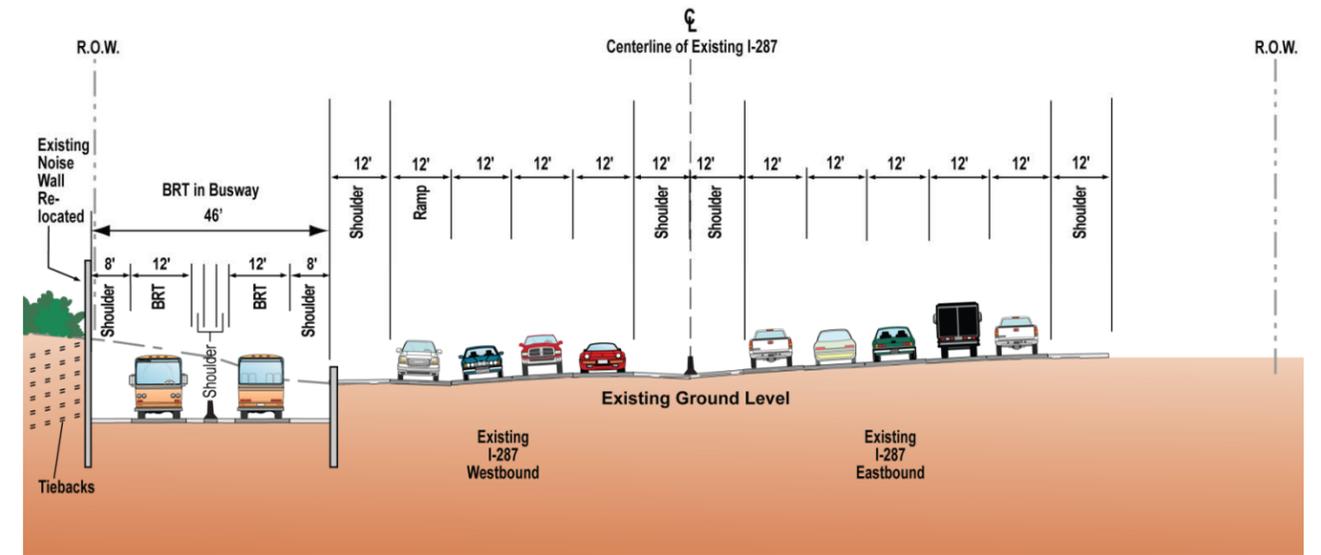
BRT Busway in Elmsford/Greenburgh Area Typical Cross-Section at Knollwood Road
